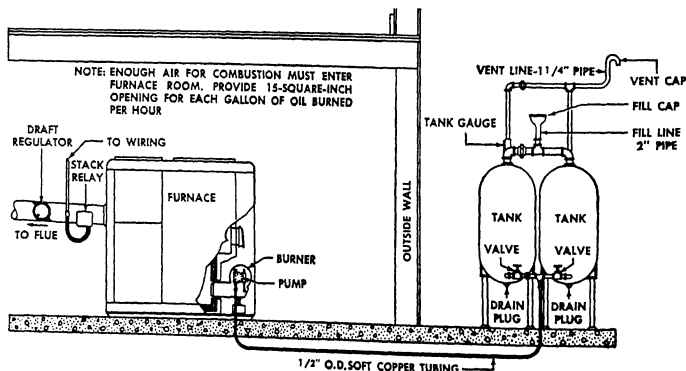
Diagram of piping for inside or outside elevated tank installations.
